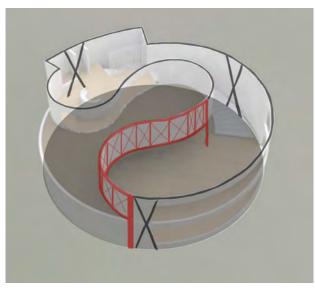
| The red part shows the truss-like structure for the green and technical façade
